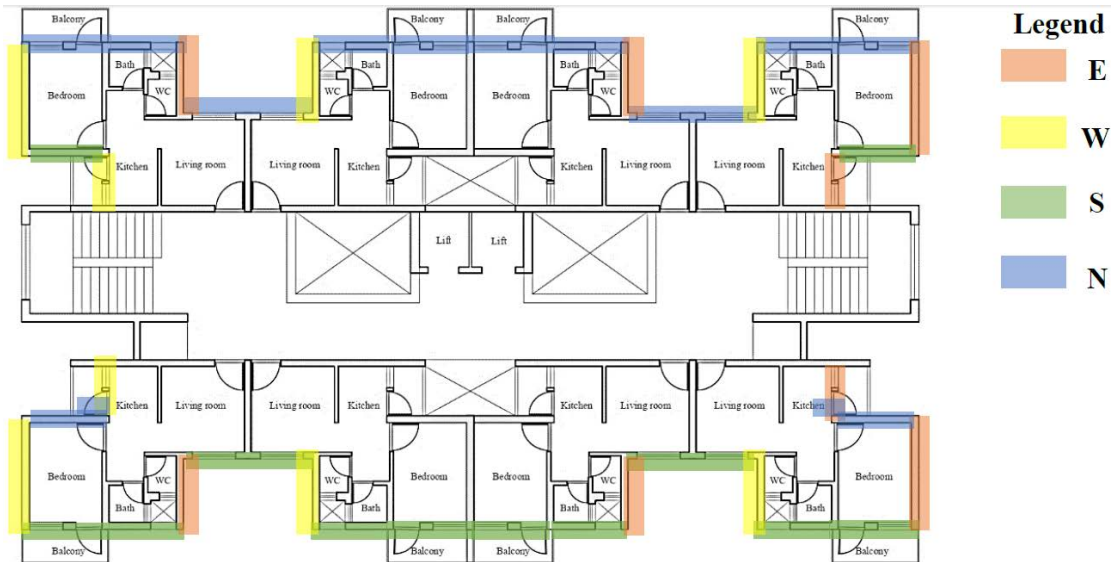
Wall related details should be restricted to external walls of the dwelling units
